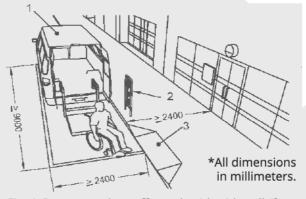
Passenger drop off area beside sidewalk/footpath.
